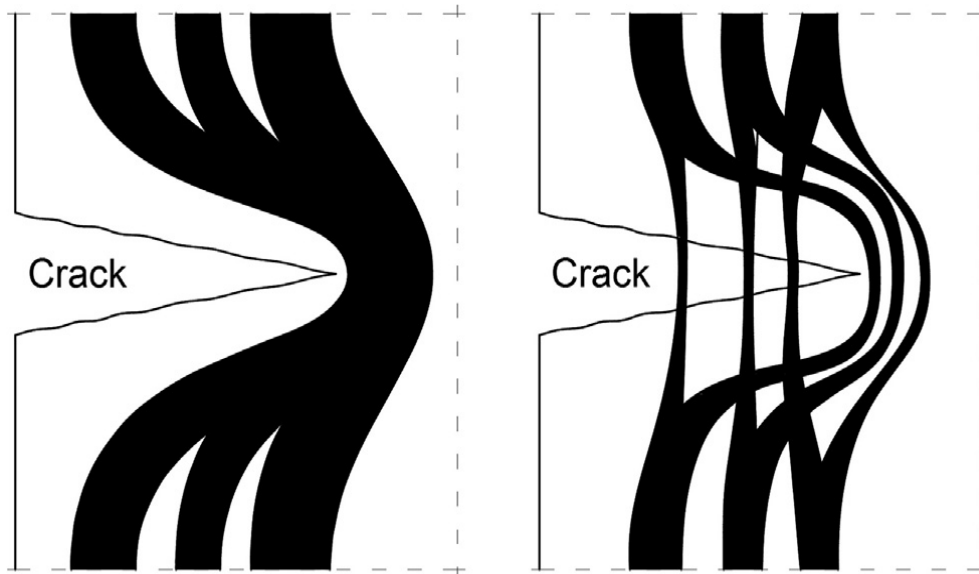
An illustration of members without and with fibres on a cracked section (Mohammadi et al. 2008)
